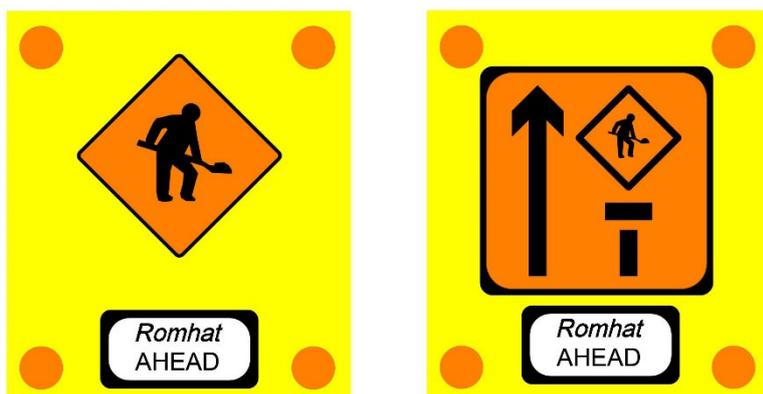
Setting-out Roadworks Ahead Signs to be removed
